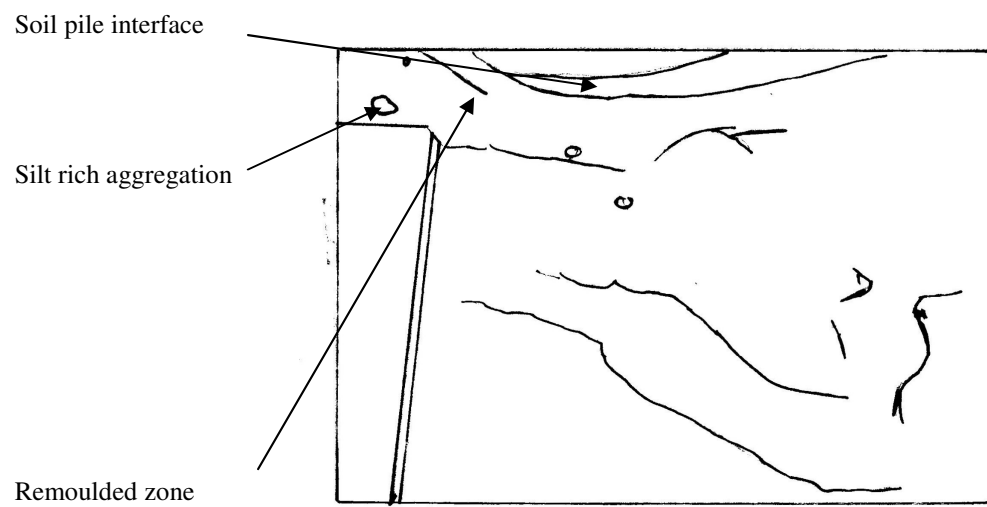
The remoulded zone from around pile MR2 at 1000-1457mm below ground level
